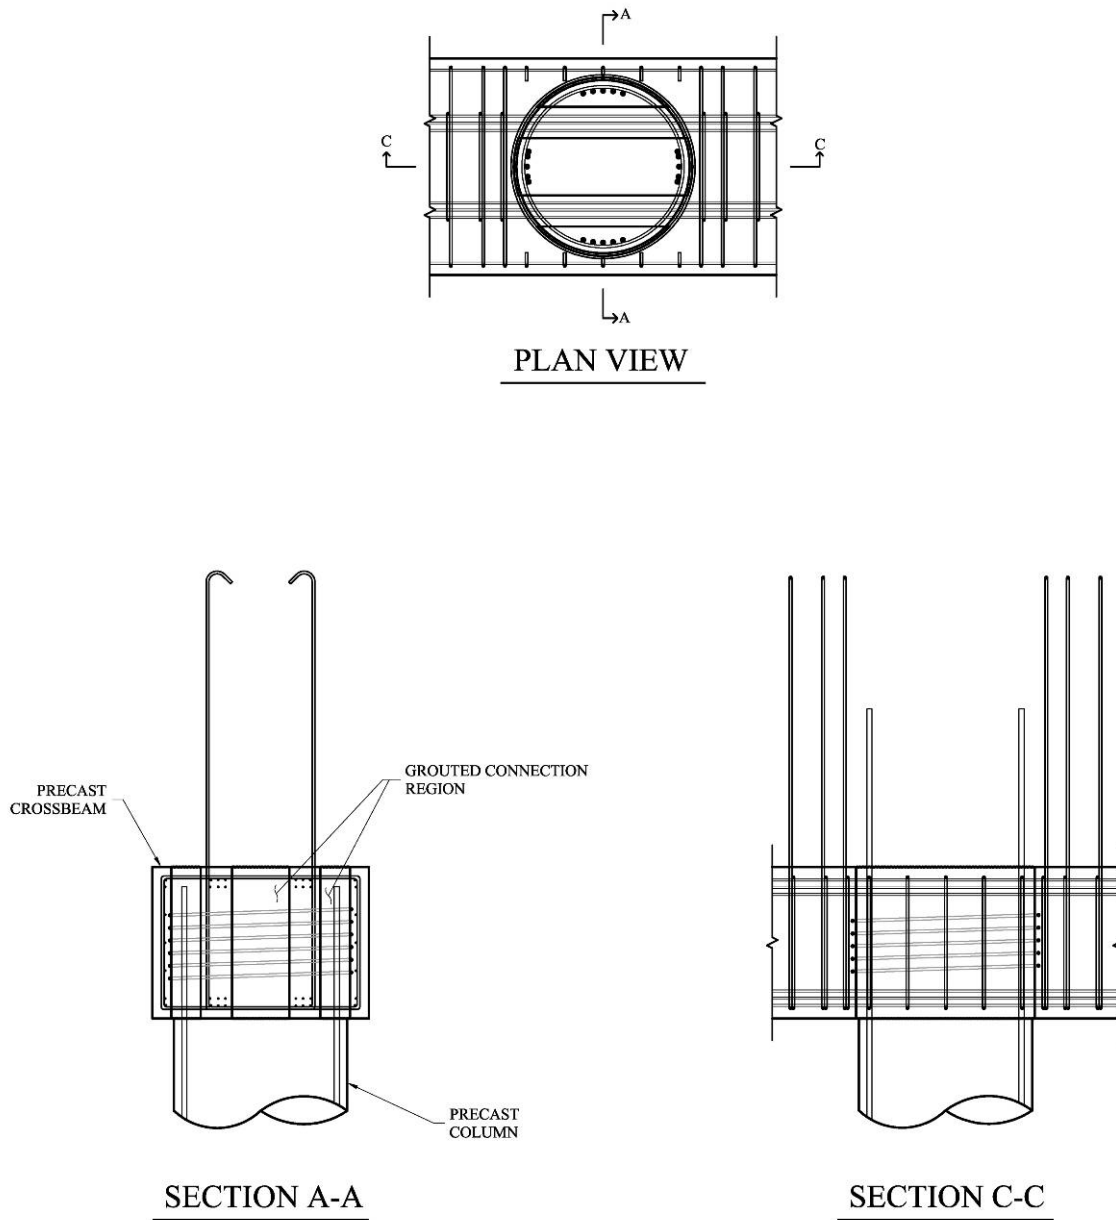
Column and Cap-Beam for Slotted Opening Connection for Reinforced Concrete Frames
